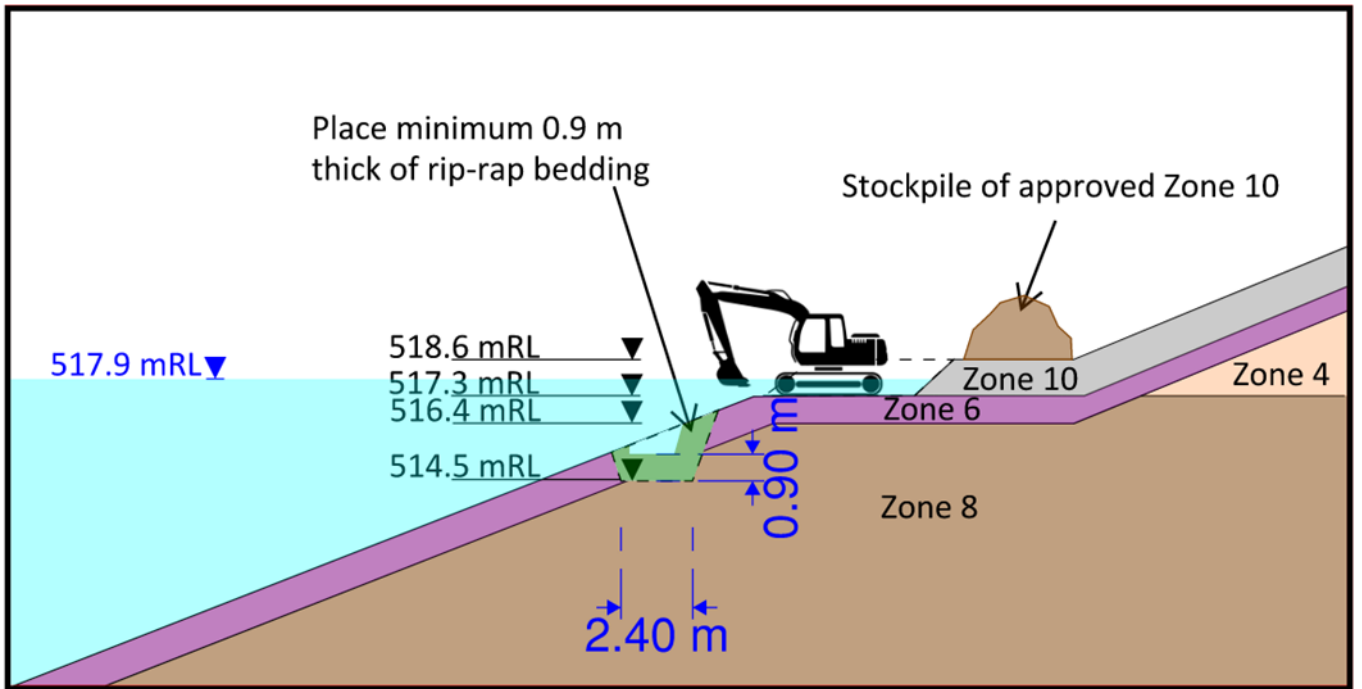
Schematic sketch – Tranche 1 – Main Dam – construction of key toe at 514.5 m RL and installation of rip-rap bedding
